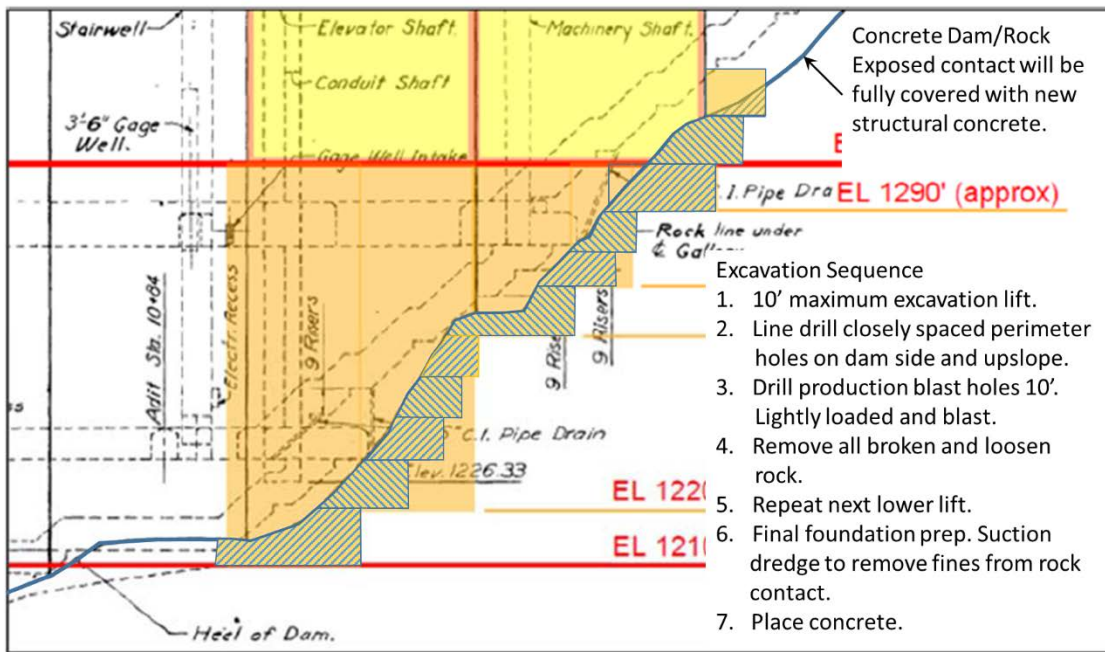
Preliminary Concept of Rock Excavation Sequencing
